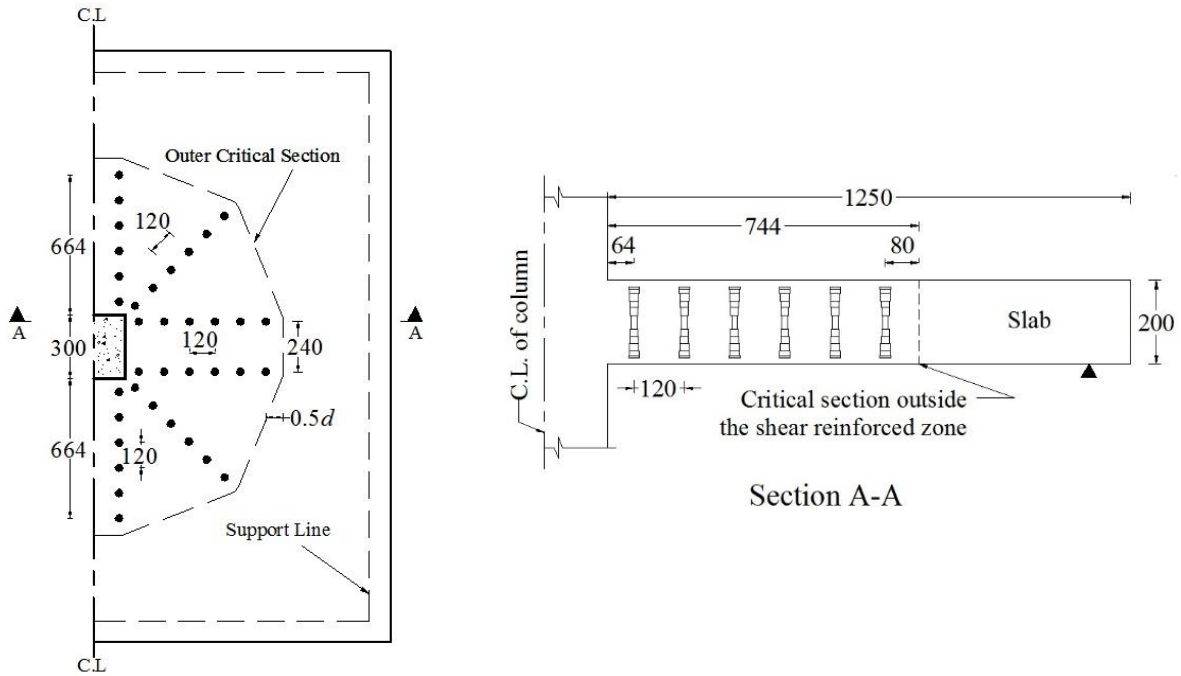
Typical column reinforcement (all dimensions are in mm)
